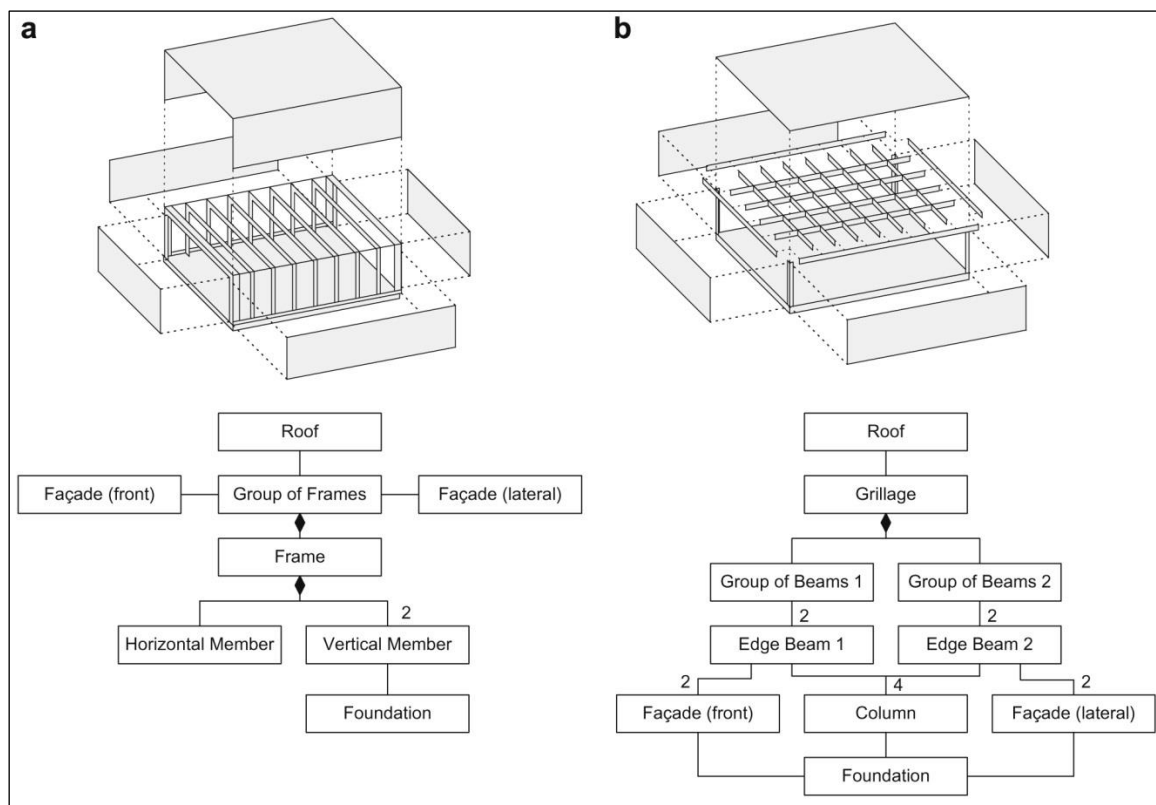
The structure of the model sets implicit constraints. Two alternative structures incorporate different aesthetic ideas of the construction: (a) a frame based design and (b) a design using four fixed columns with a grillage as roof structure.
